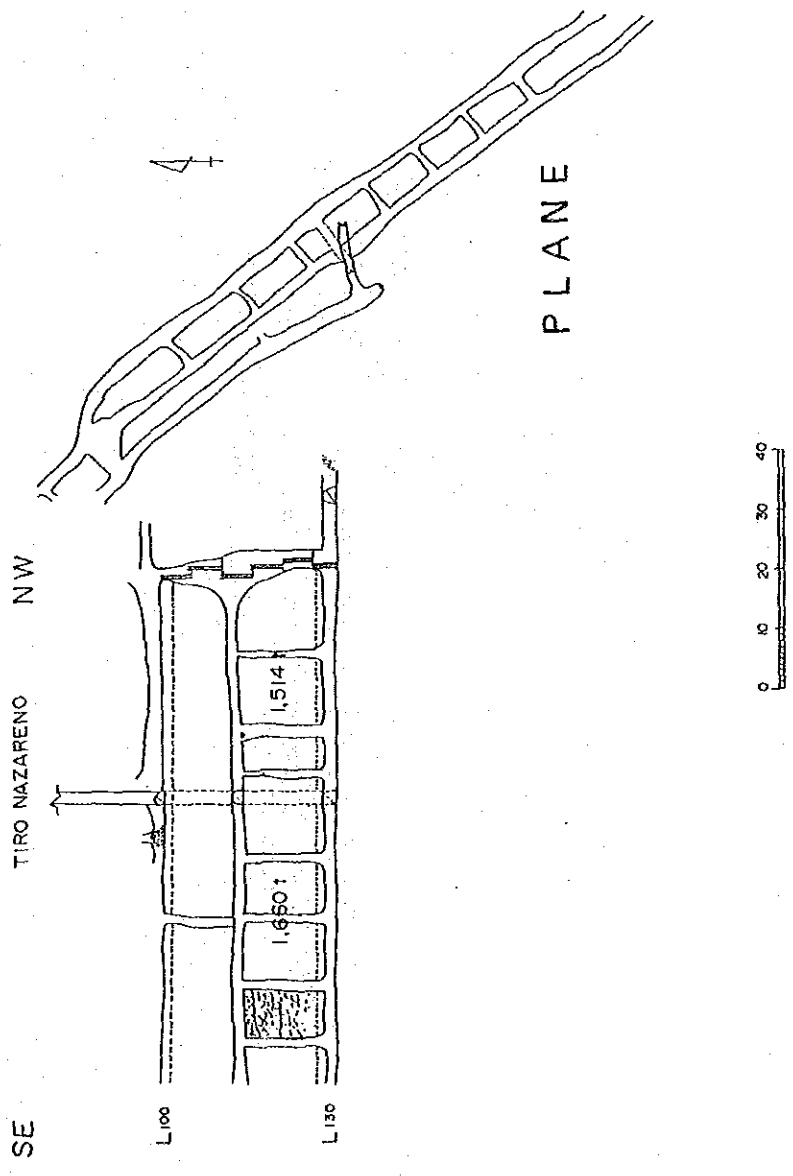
a Calicanto -Plane and Longitudinal Section-
